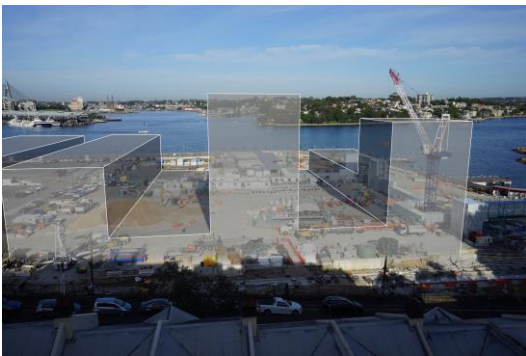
Indicative Approved Building Envelope. Level 3 of The Langham Hotel, facing west (Source: Digital Line).
